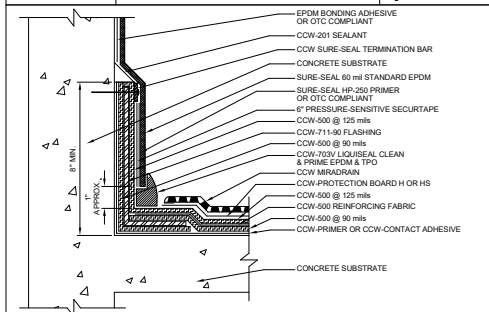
DETAIL IS INTENDED TO BE A GUIDE FOR WATERPROOFING INSTALLATION ONLY.
